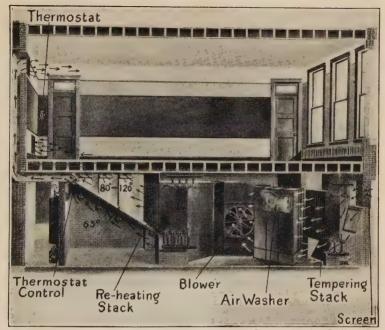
Ventilating a Building Heated by Hot Water or Steam Why does the air enter the house?
